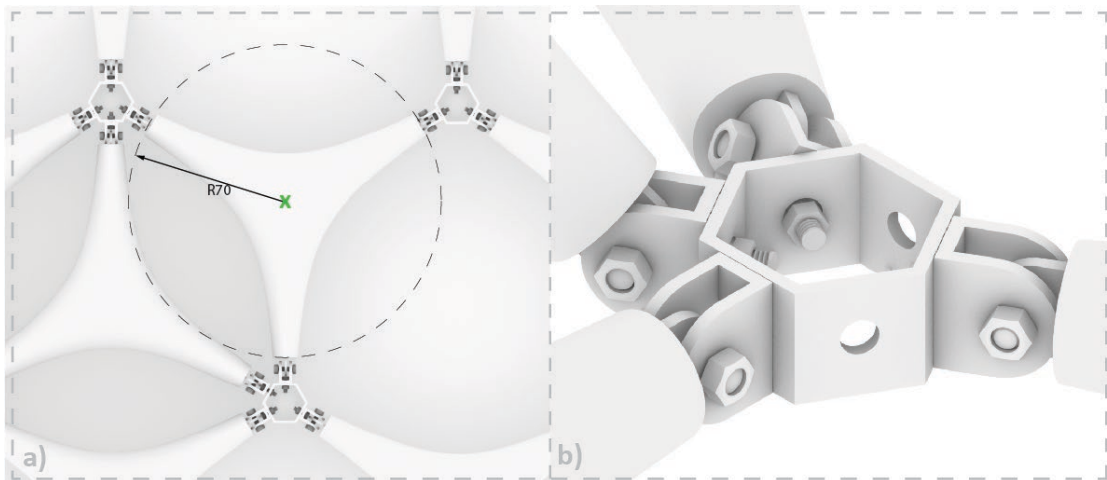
(a) Structural element, (b) steel joint member (Cilesizoglu et al., 2025).
